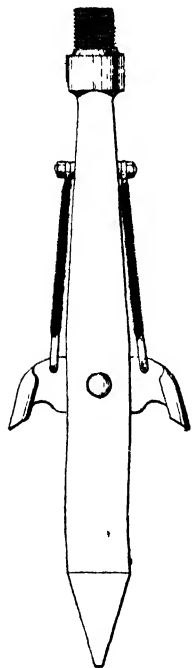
A.—EXPANDING TOOL FOR TRIMMING BORE-HOLE BELOW TUBES
